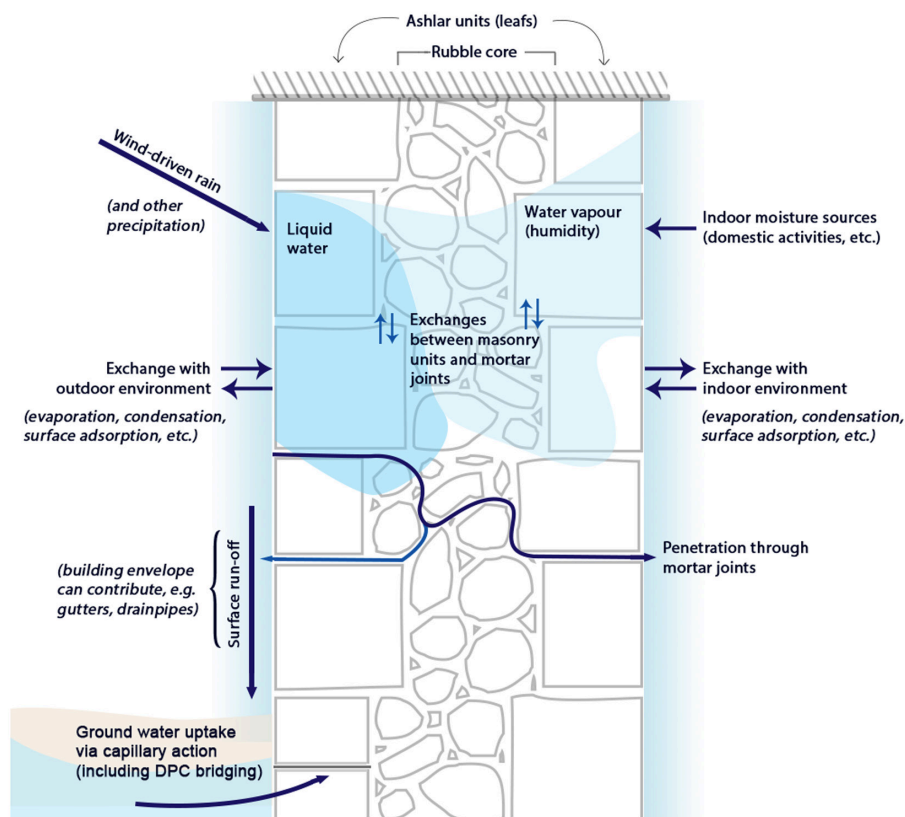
Common moisture ingress pathways for traditional structures, such as this rubble core stone masonry wall.
